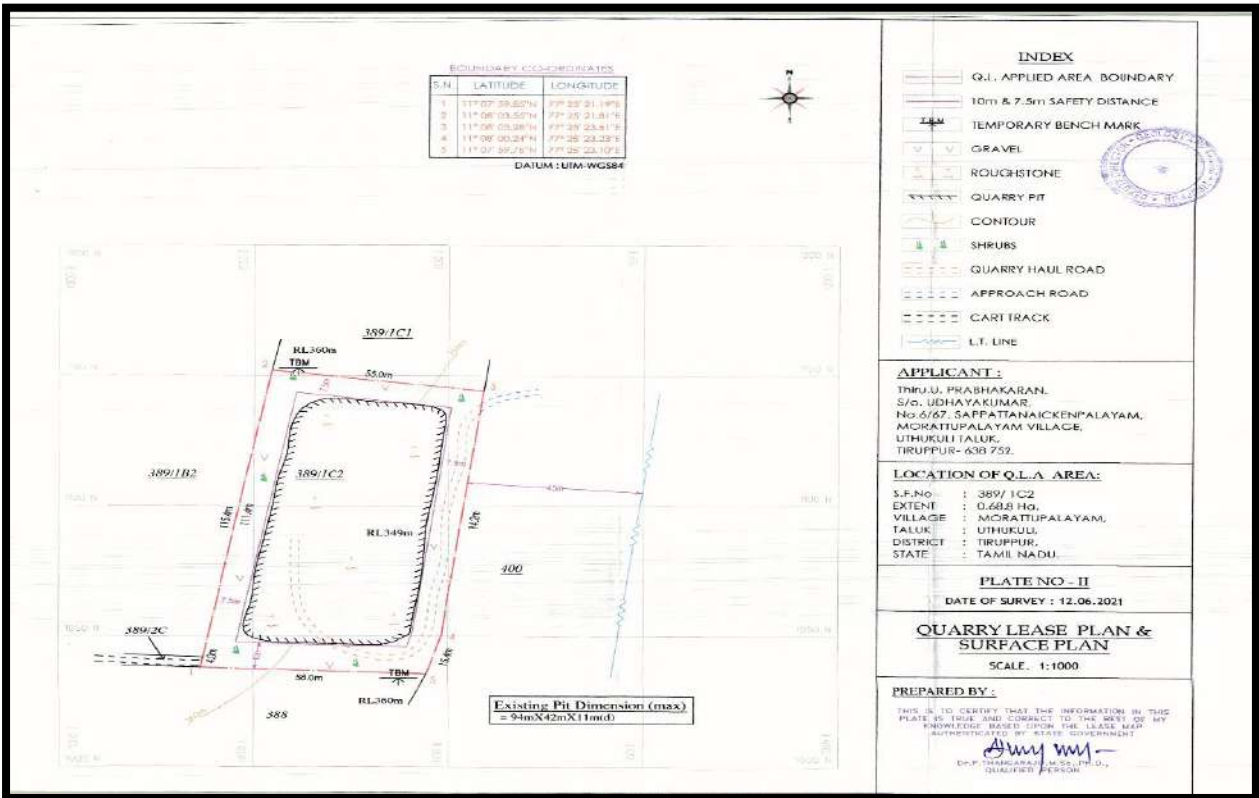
QUARRY LEASE PLAN & SURFACE PLAN
